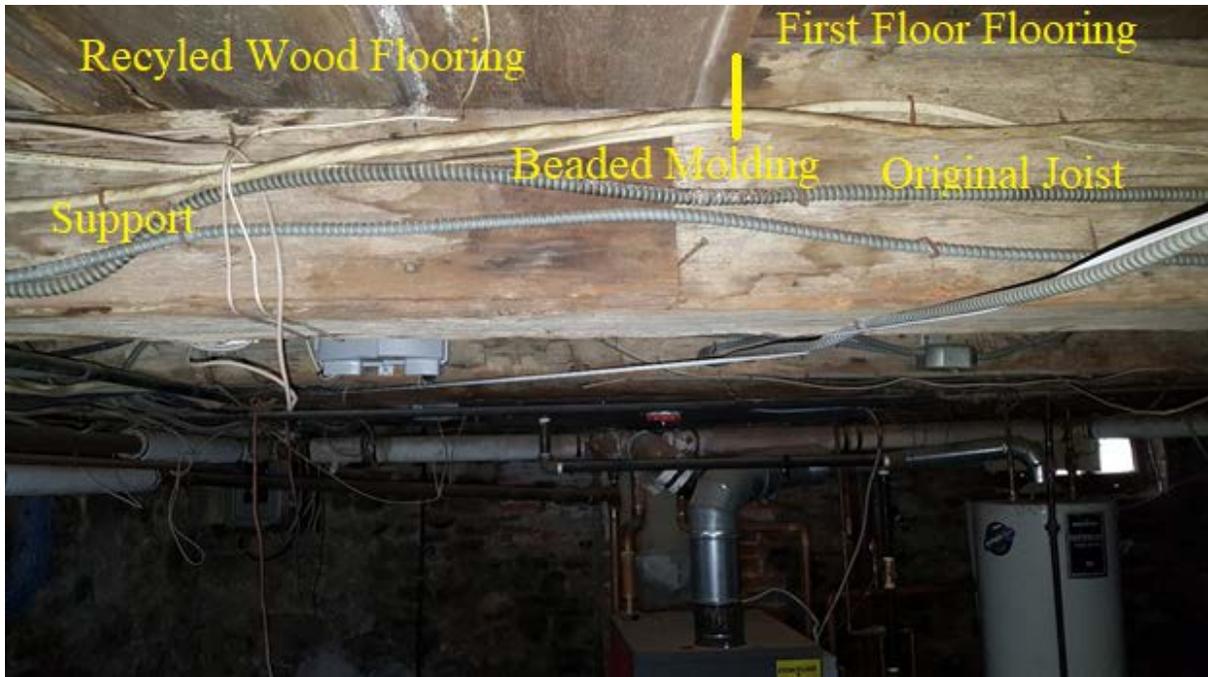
Carpenters recycled earlier flooring and strung them across several joists to support the tile in the vestibule. The boards were lowered and held in place with a support nailed to the original joists. The end of the box was closed in with beaded molding that was also recycled during the remodeling. The boxed in framing would have held a mortar mix for the tiles. Photograph by Mark Nonestied
